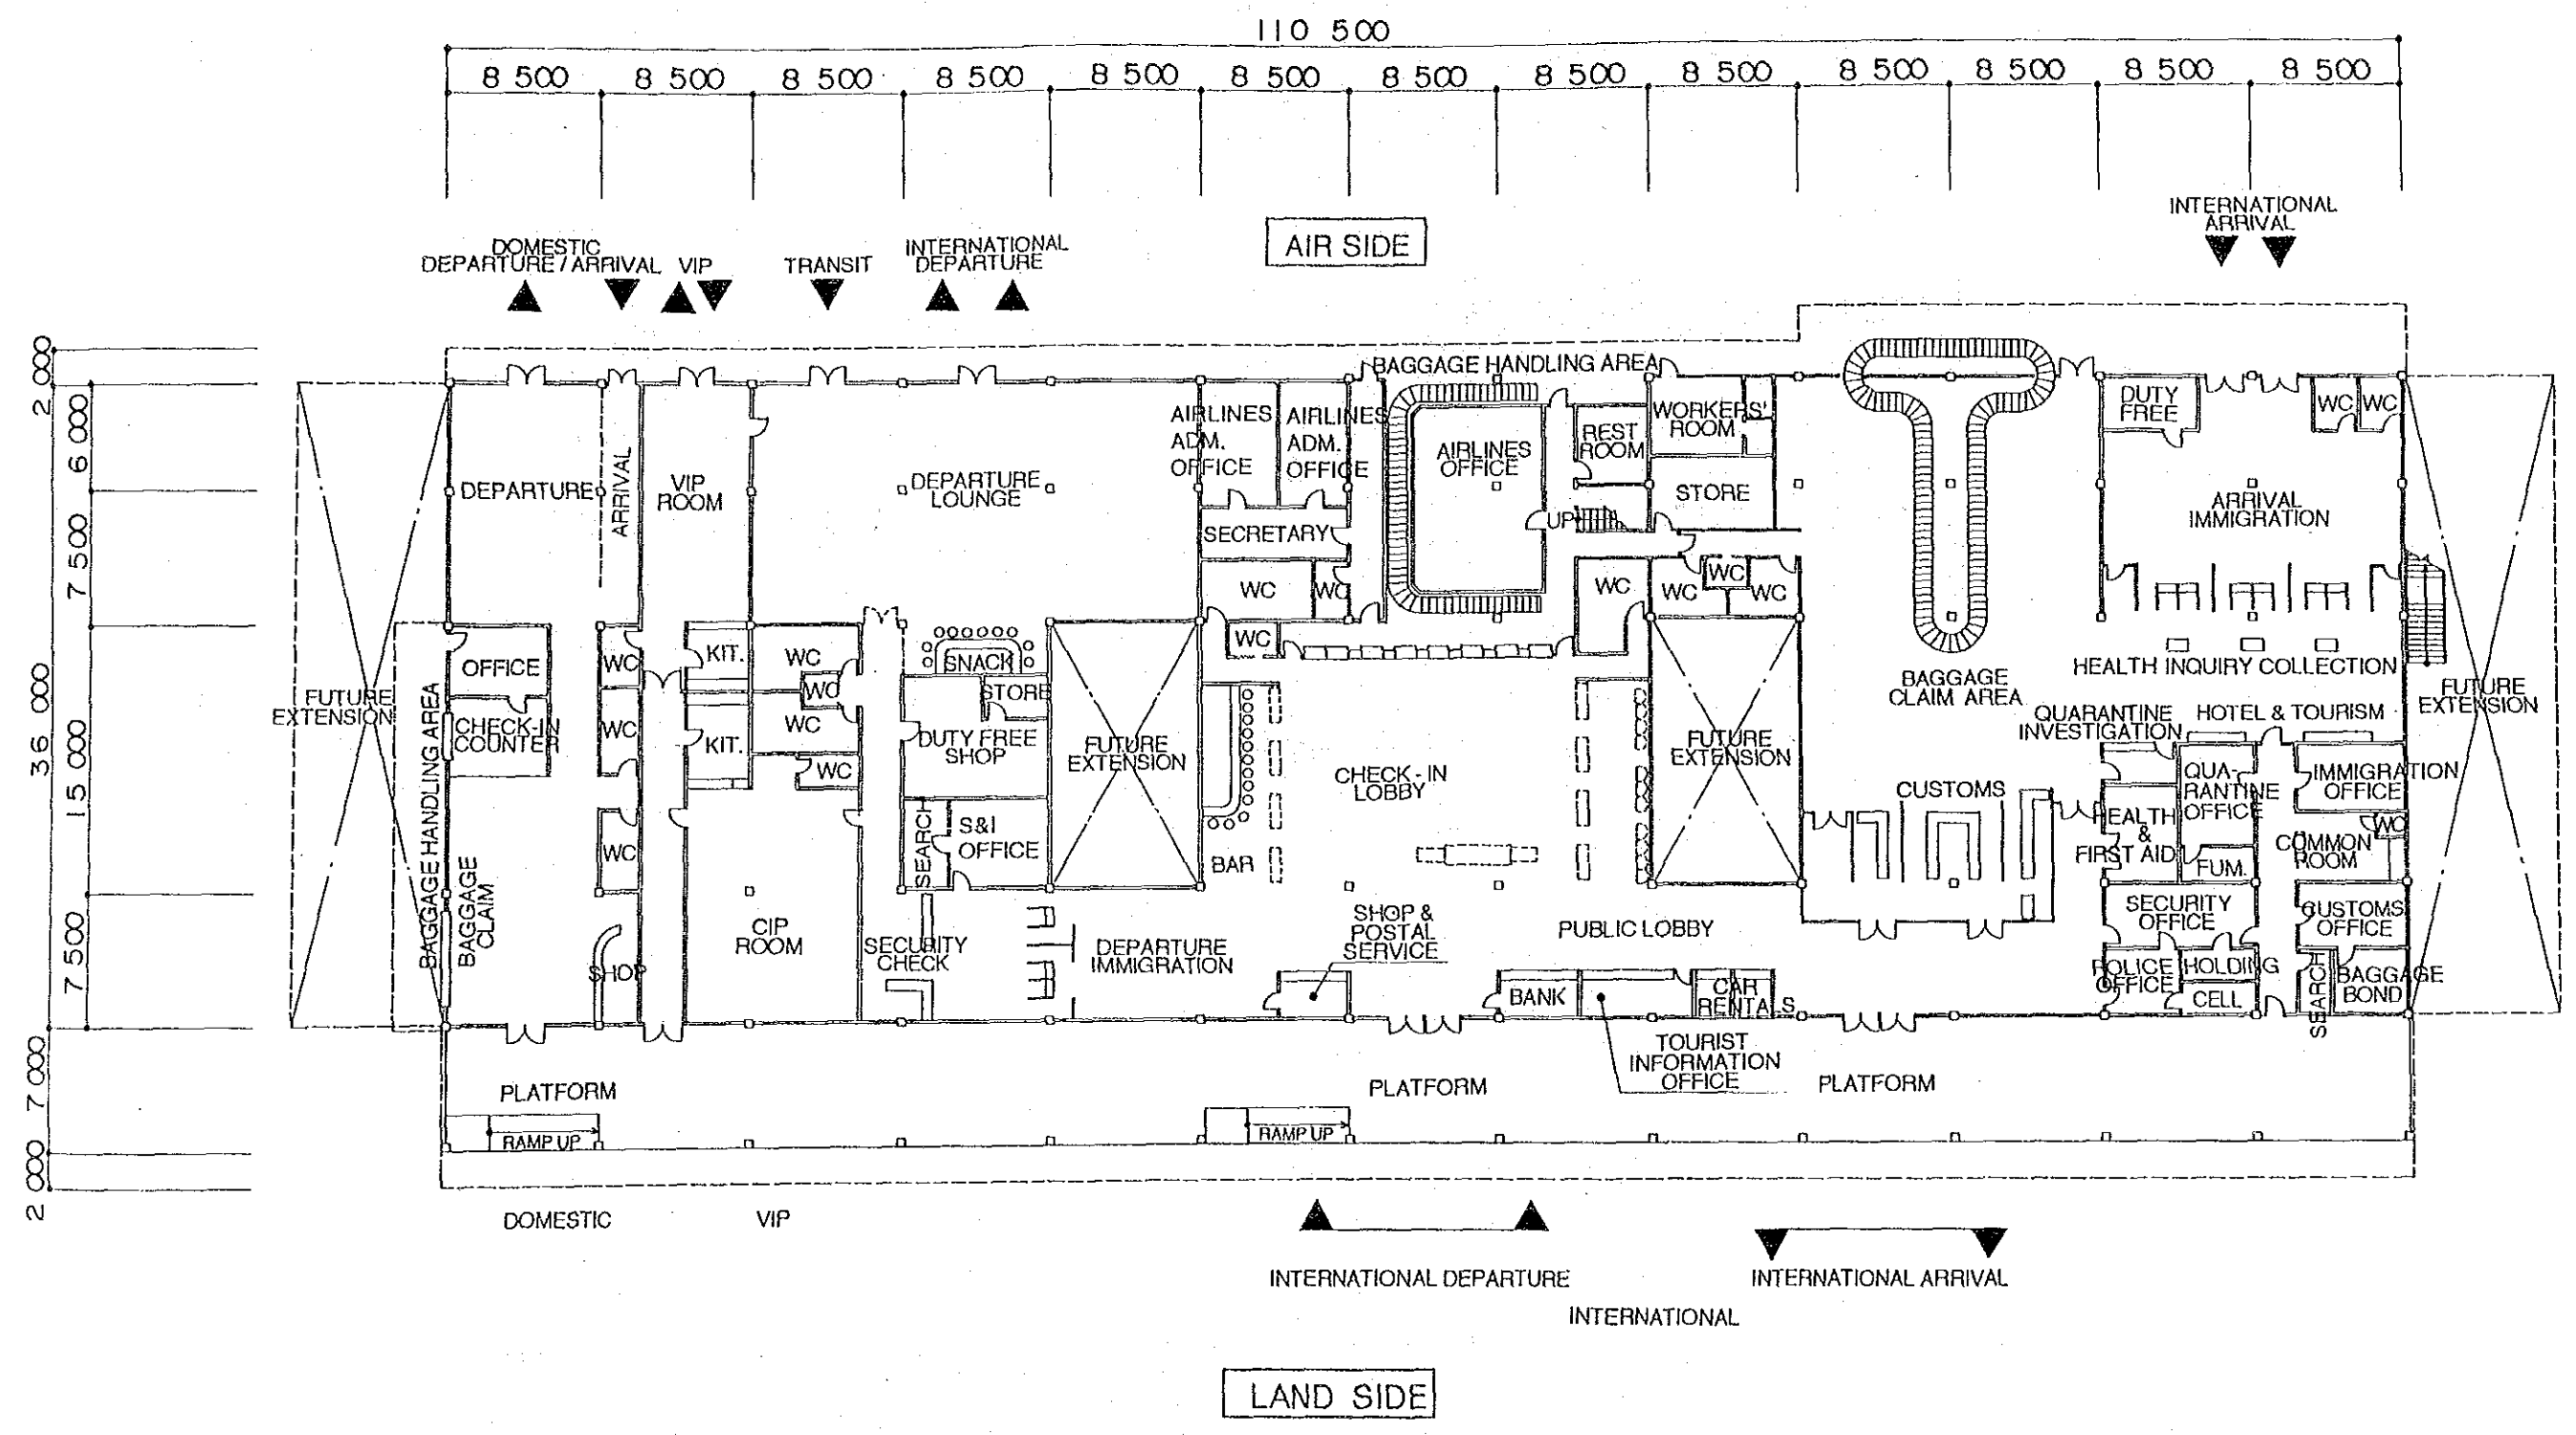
Layout Plan of Passenger Terminal Building (Ground Floor)
